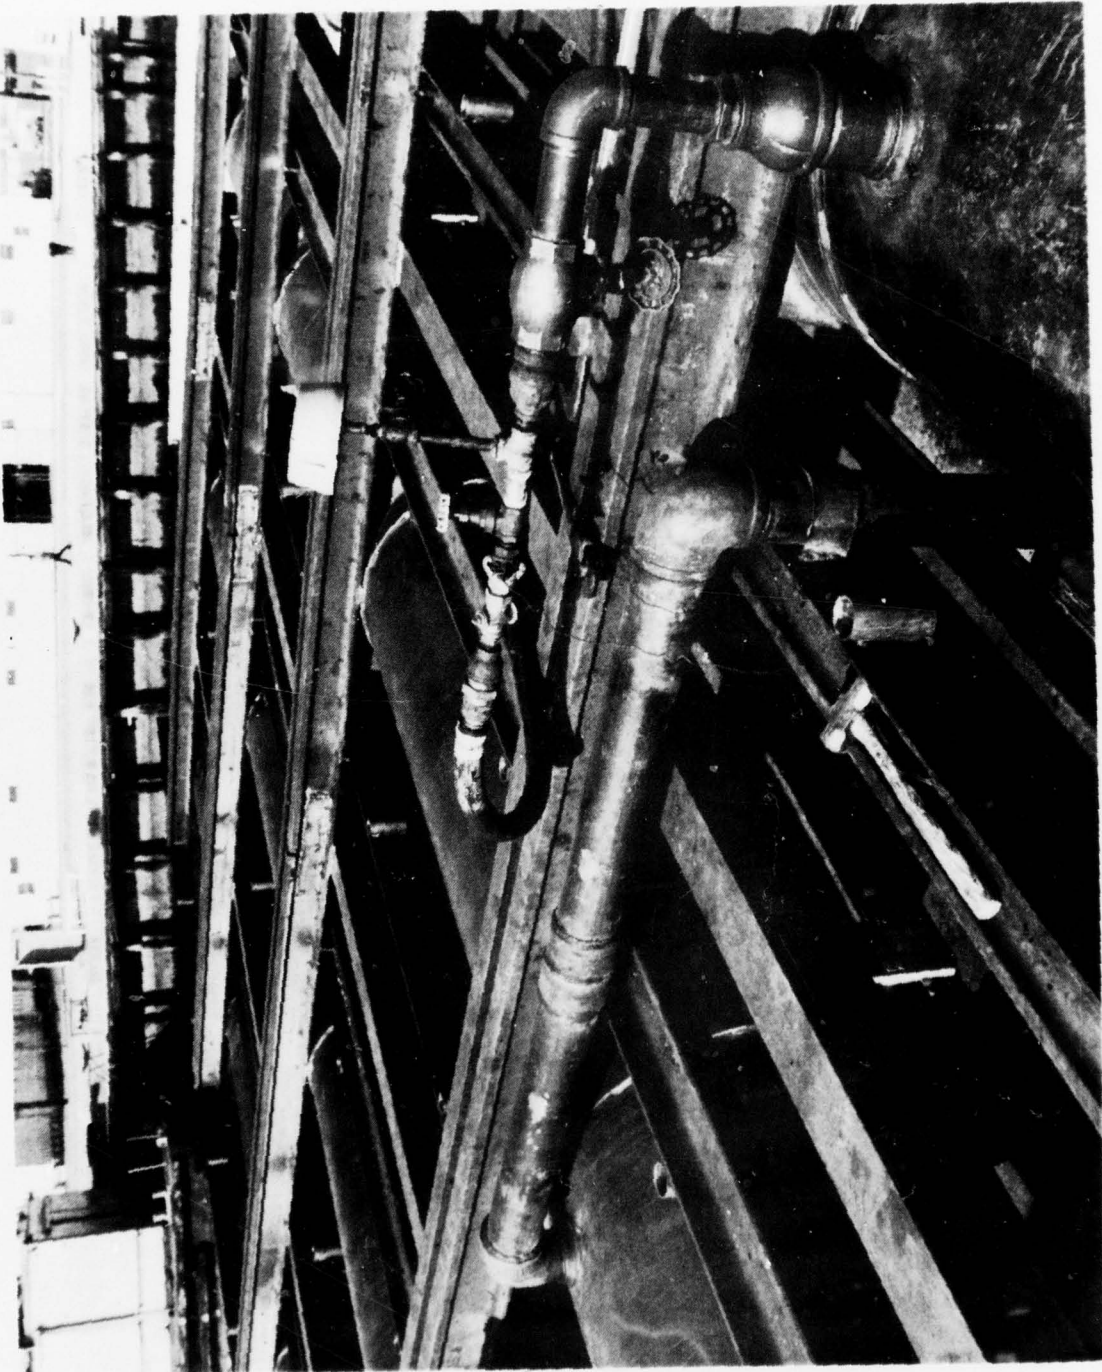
Interconnecting pipe, and equipment for hydrostatic test.
